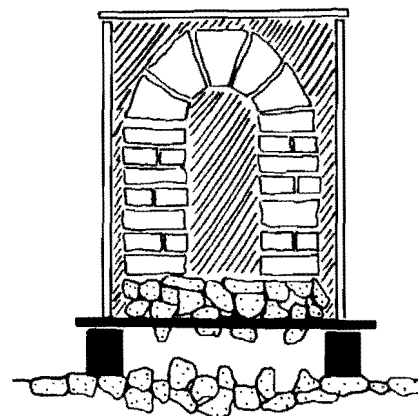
Rubble foundation is difficult to extract and rests between metal plates which support the structure.
